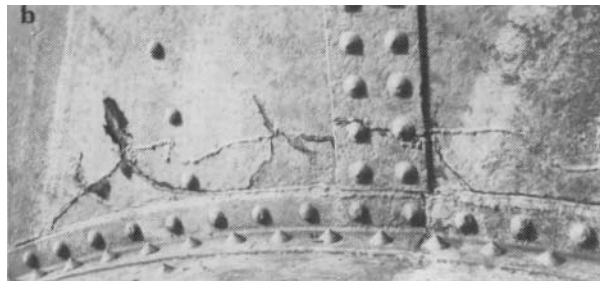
Fatigue crack at tack weld on a riveted member
